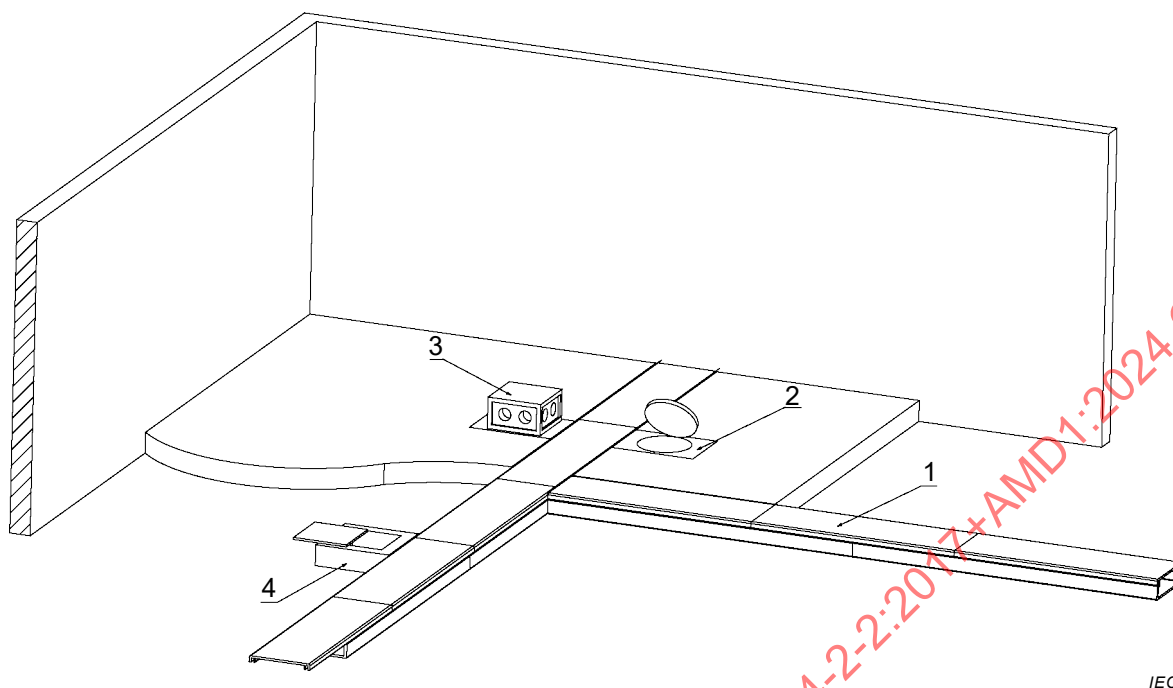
Onfloor CTS/CDS – Installed above the upper level of the floor
